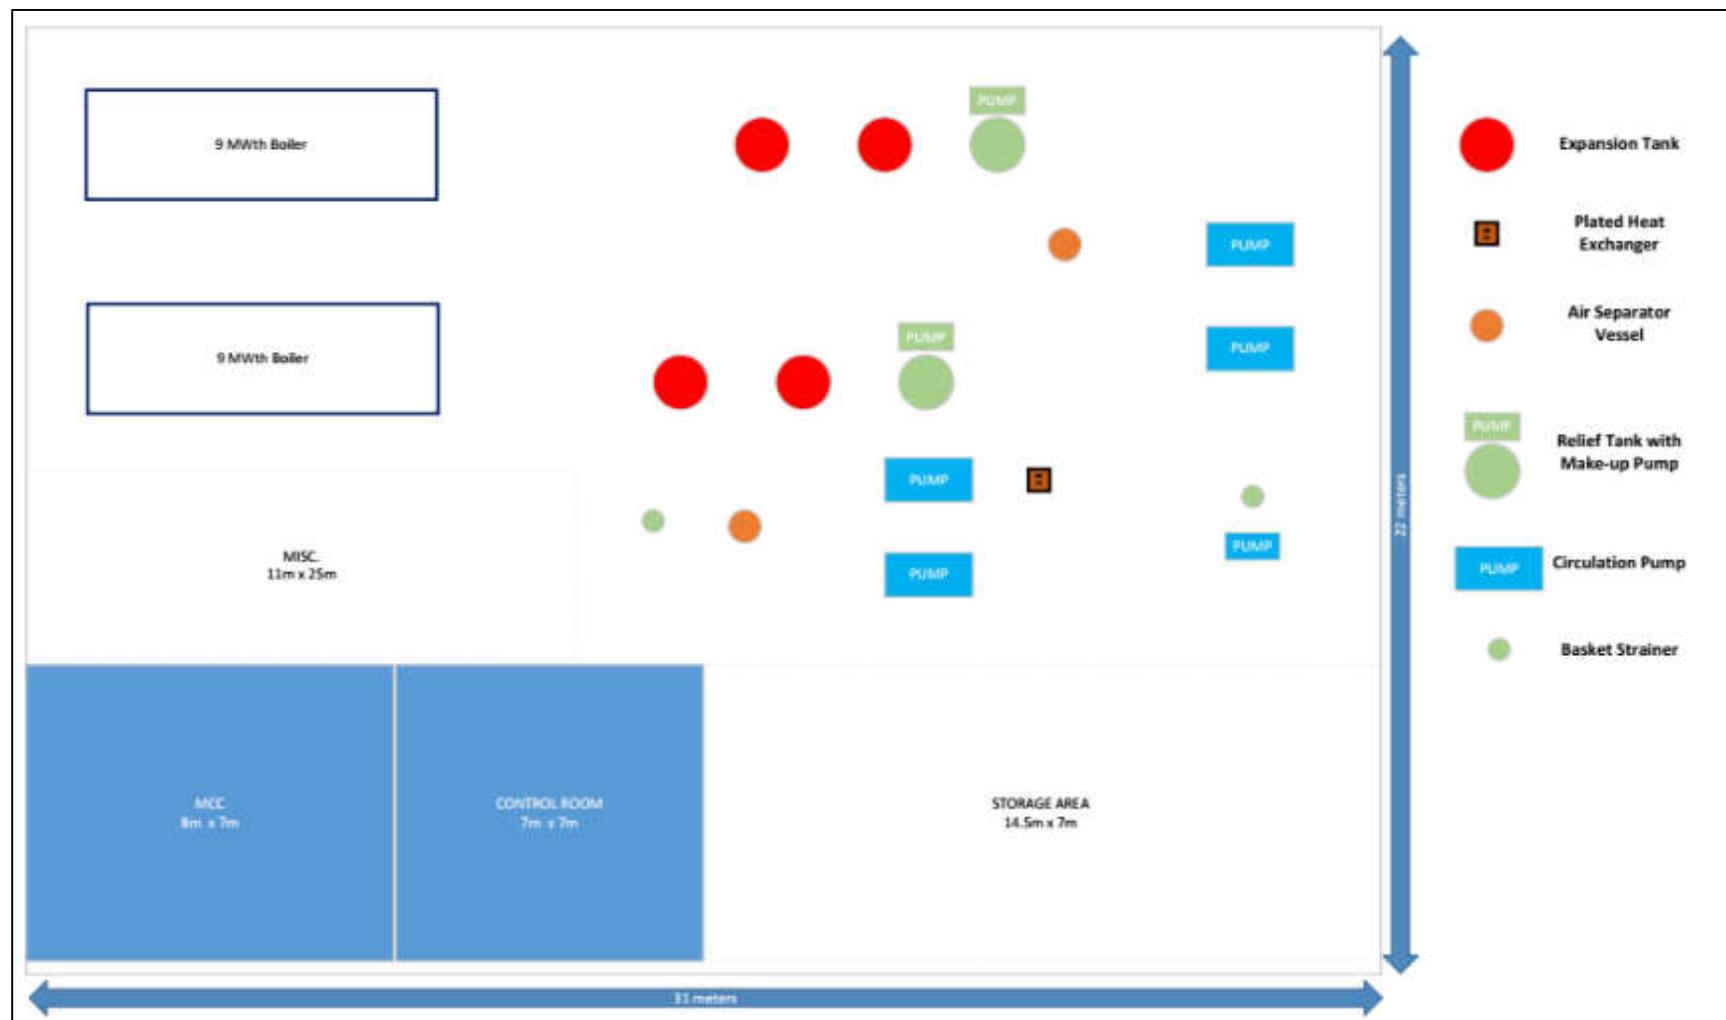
Proposed general arrangement of the District Energy Centre (Appendix D.12)
